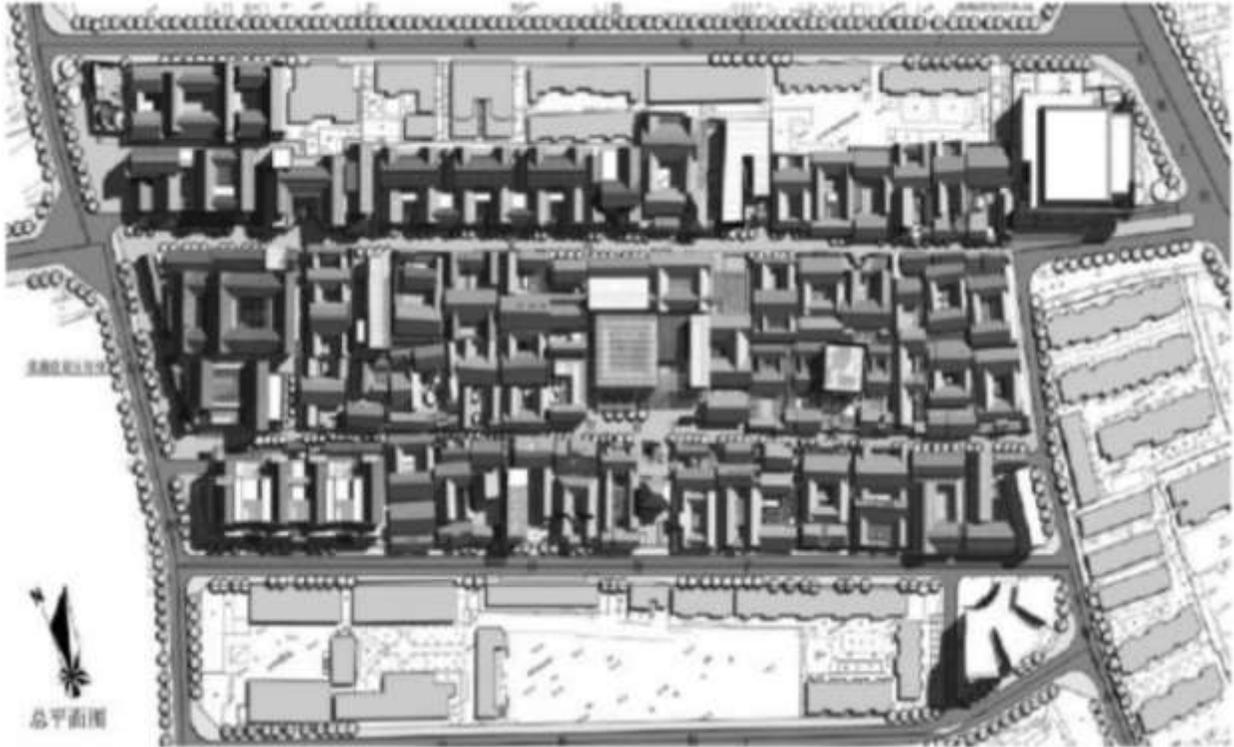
The site plan of the Broad and Narrow Alley (Baidu n.d.)
